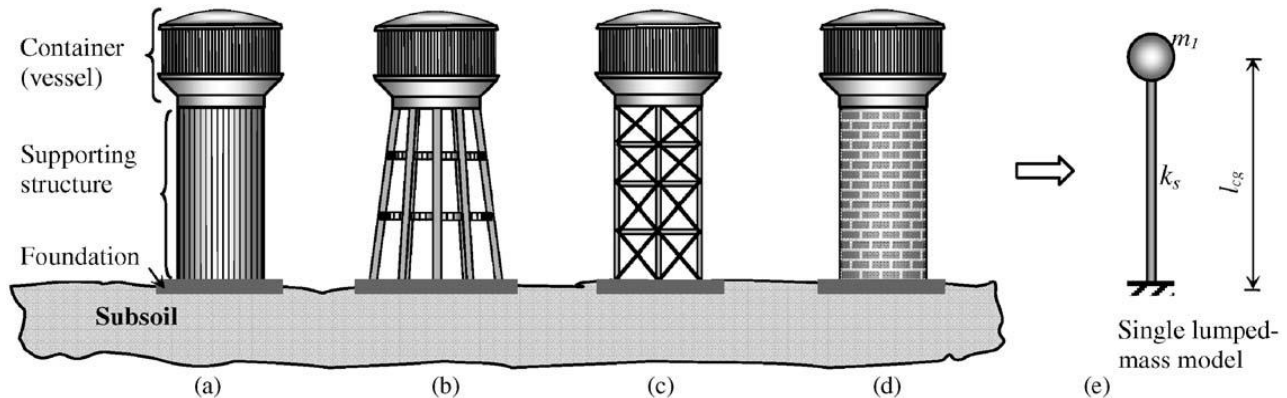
Elevated tanks and the single lumped-mass model: (a) the tank with reinforced concrete shaft supporting structure, (b) the tank with reinforced concrete frame supporting structure, (c) the tank with reinforced concrete frame with diagonal braces or steel frame supporting structure, (d) the tank with masonry pedestal supporting structure, (e) single lumped-mass model.
